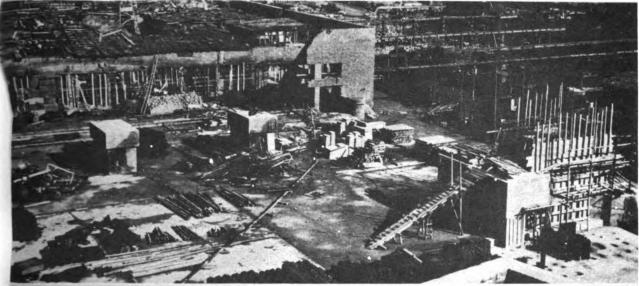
View looking northwest - showing 8 ft, thick reinforced concrete roof slab with vent shafts. Note construction in progress to right, and disruptive pattern painting on vent shafts. Section of repaired Bldg. R in rear. Note unfinished stock piles.
